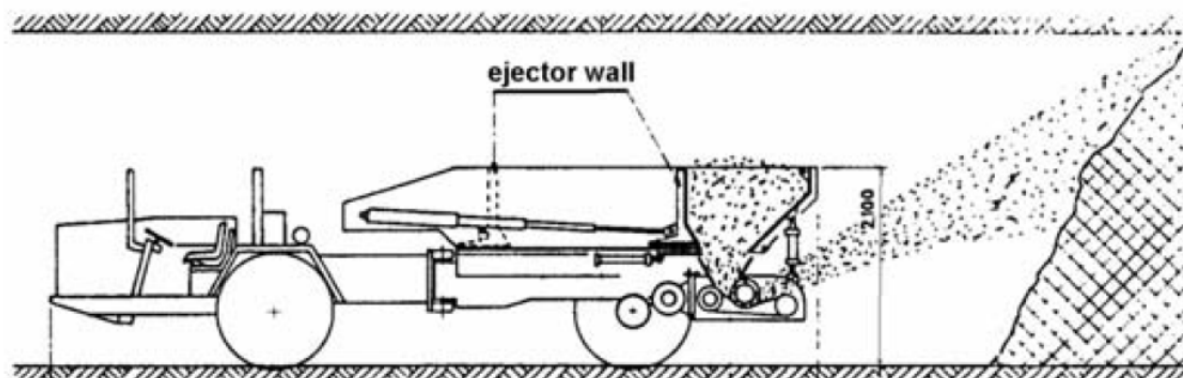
Typical Run of mine Salt Backfill Emplacement “Slinger”
